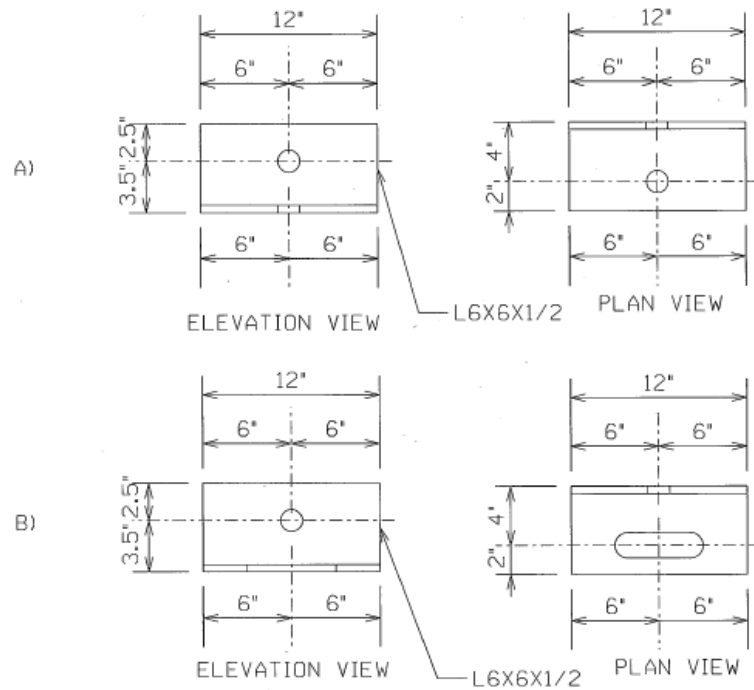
Little Bear Creek Bent 2 & 3 Connections for Bulb Tee Girders
